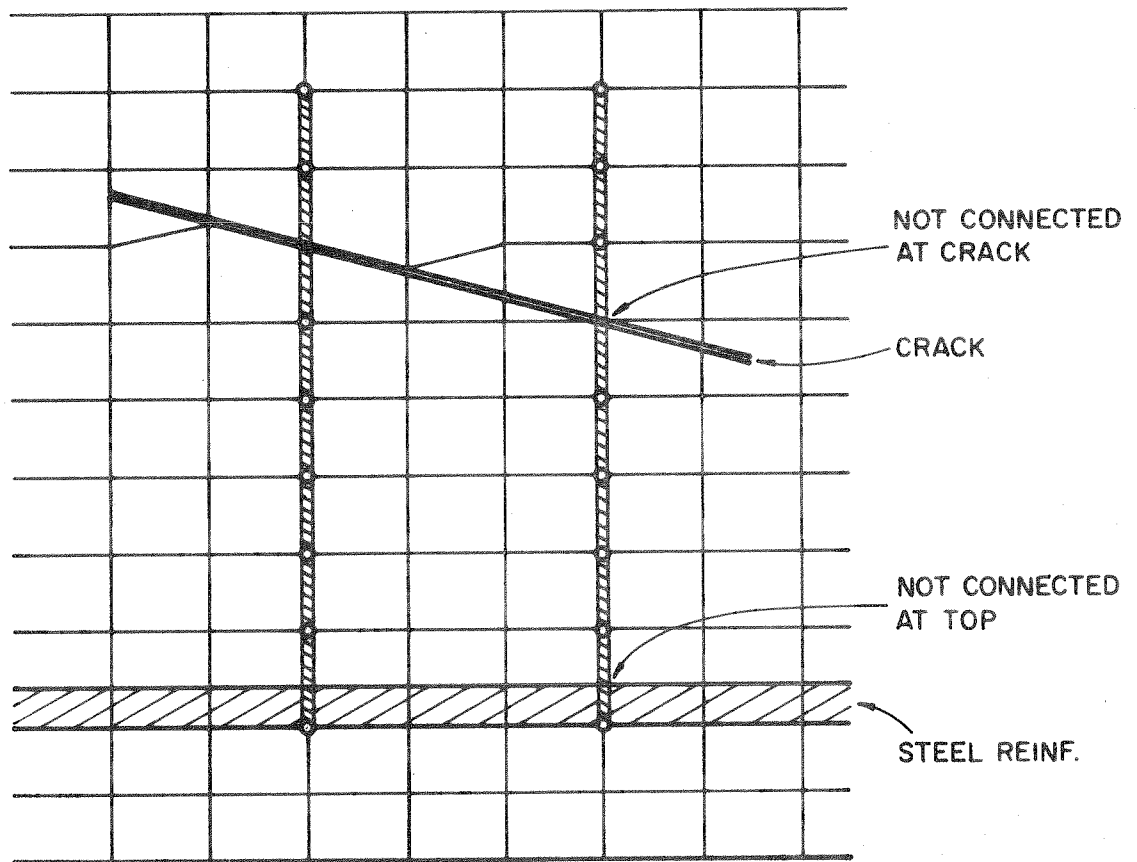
DETAIL OF TYPICAL STIRRUP CONNECTION
